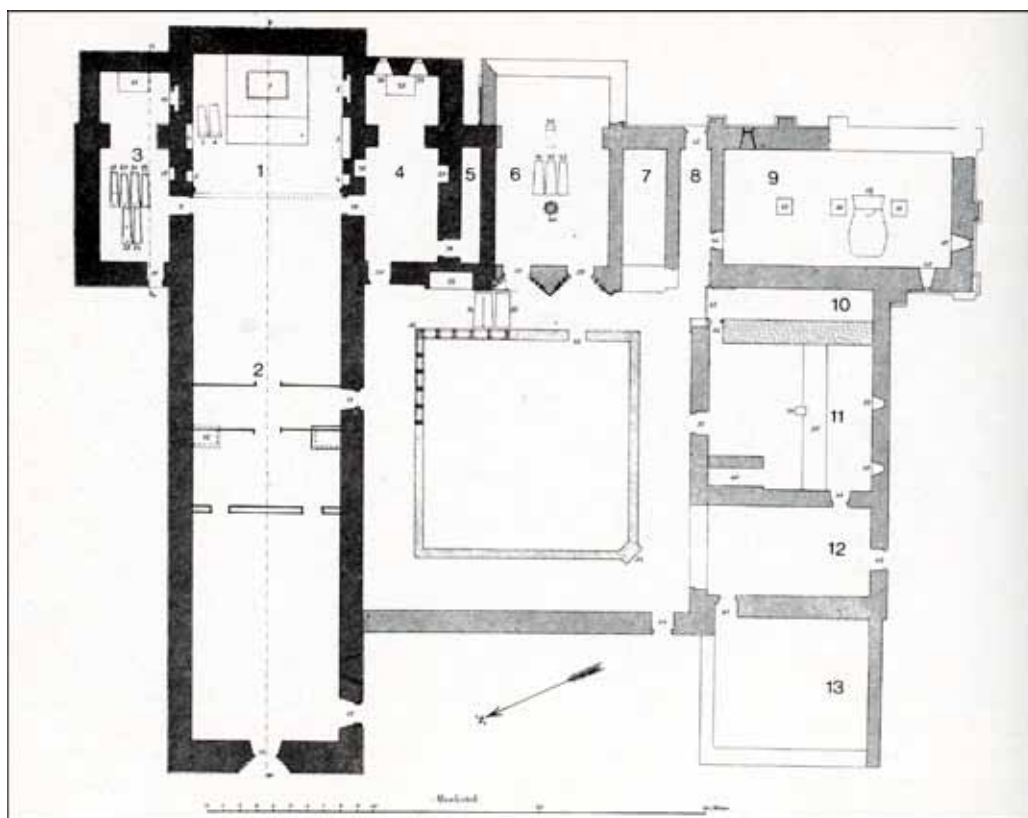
The layout or ground plan of the central buildings at Lyse Abbey, with the church in the north wing to the left. As was customary for a monastery, and especially a Cistercian monastery, the cloister and the claustral buildings were situated to the south of the church. The cloister garth or garden, open to the sky, was traditionally surrounded by four cloister walks or galleries, passages giving covered access to the surrounding buildings. The east and south wing had claustral buildings in stone. If there, as would be normal, was a west wing at Lyse, this seems to have been in wood. This west wing, together with the western part of the church, was the area for the lay-brothers in the monastery (See fig. 3). Drawing by Johan Meyer, 1890. After Nybø, 1987
